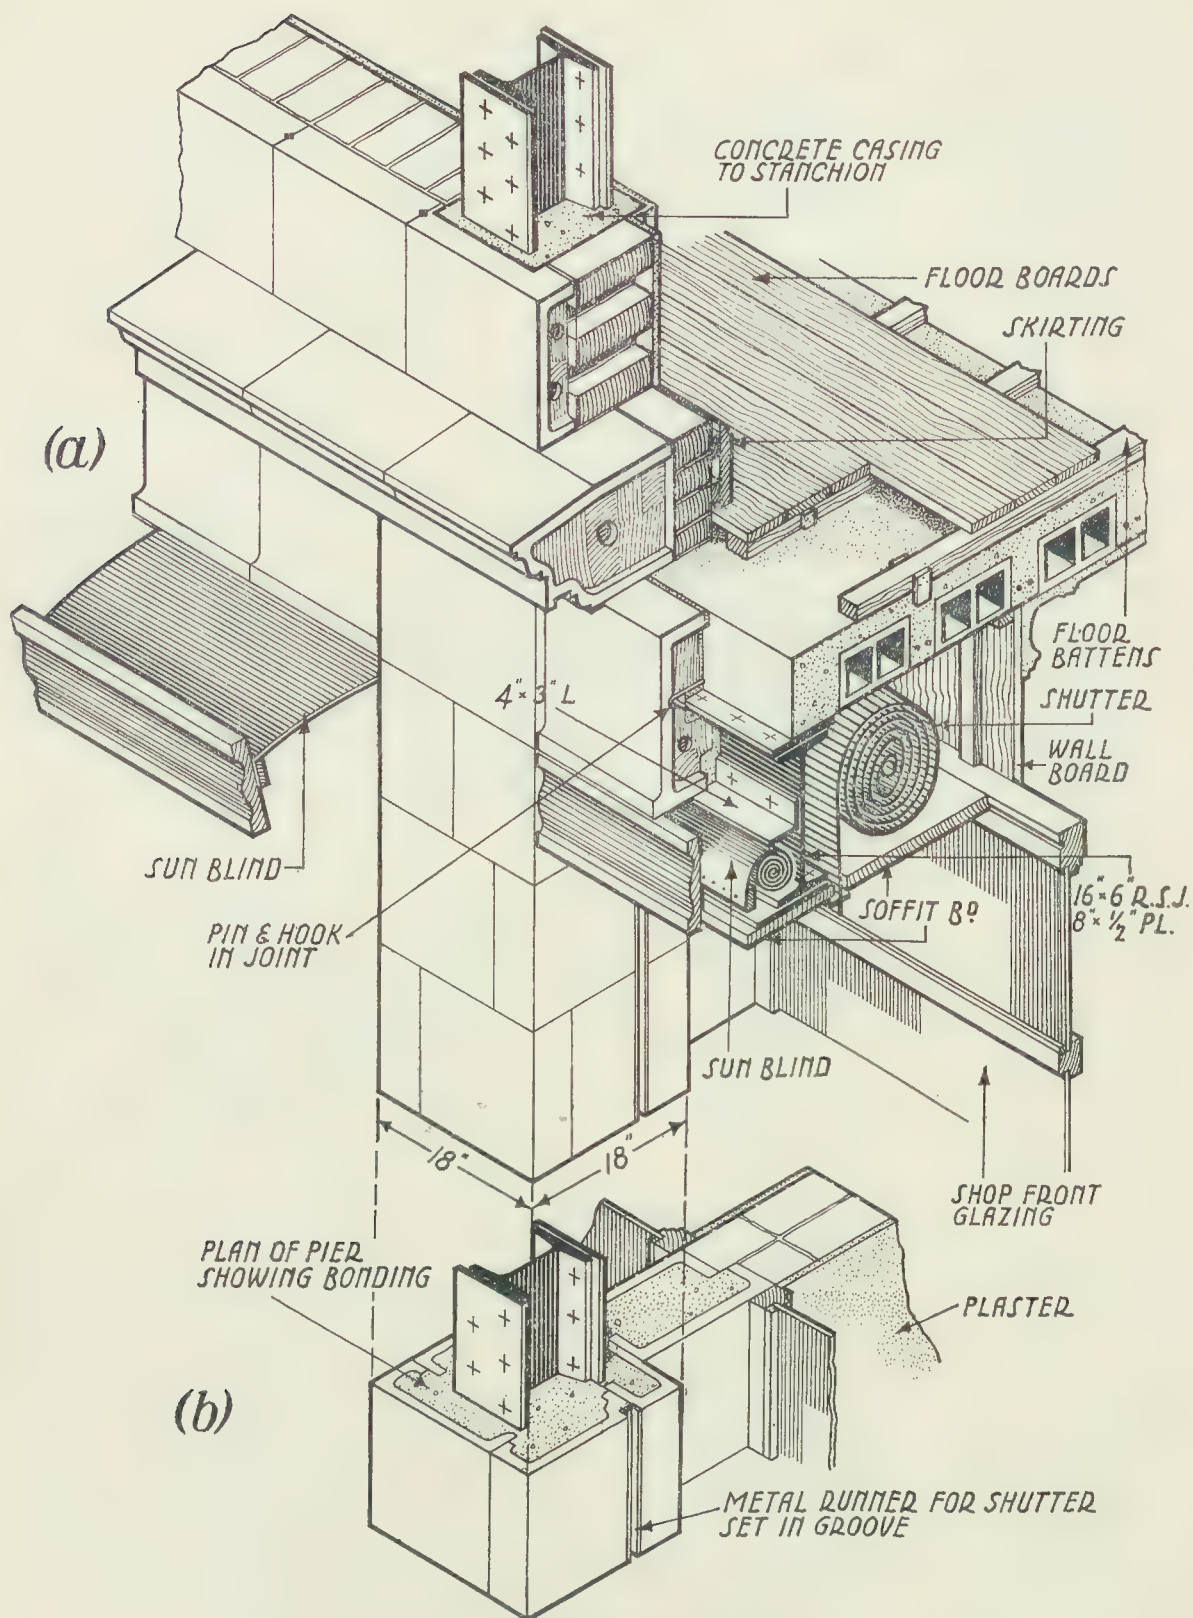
CONSTRUCTION OF A SHOP FRONT FACED WITH TERRACOTTA
